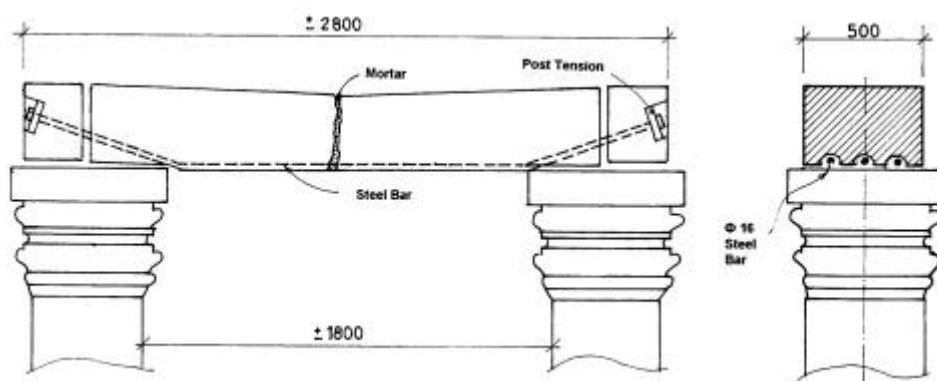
Repair and strengthening of bearing beam by post tensioned steel bars
